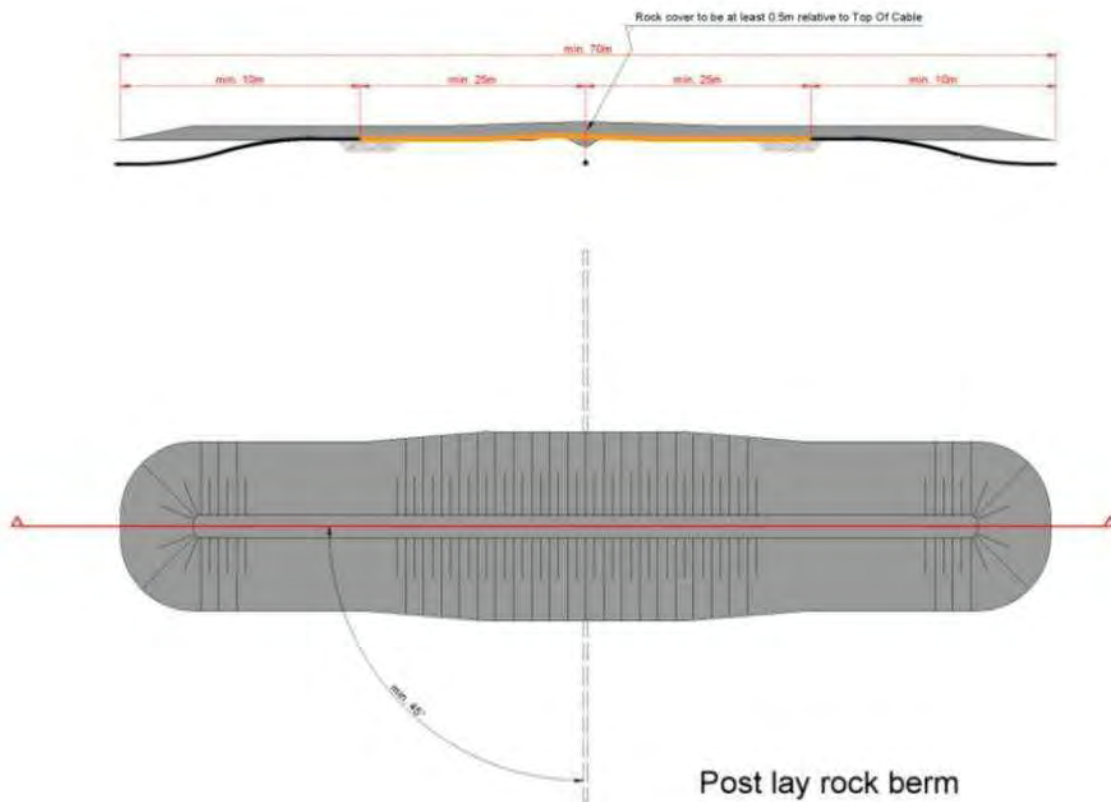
Typical lowering 3rd party asset - rock crossing structure
